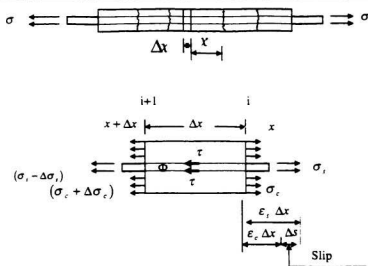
Stresses and strains on a reinforced concrete element of a finite length in tension specimen
